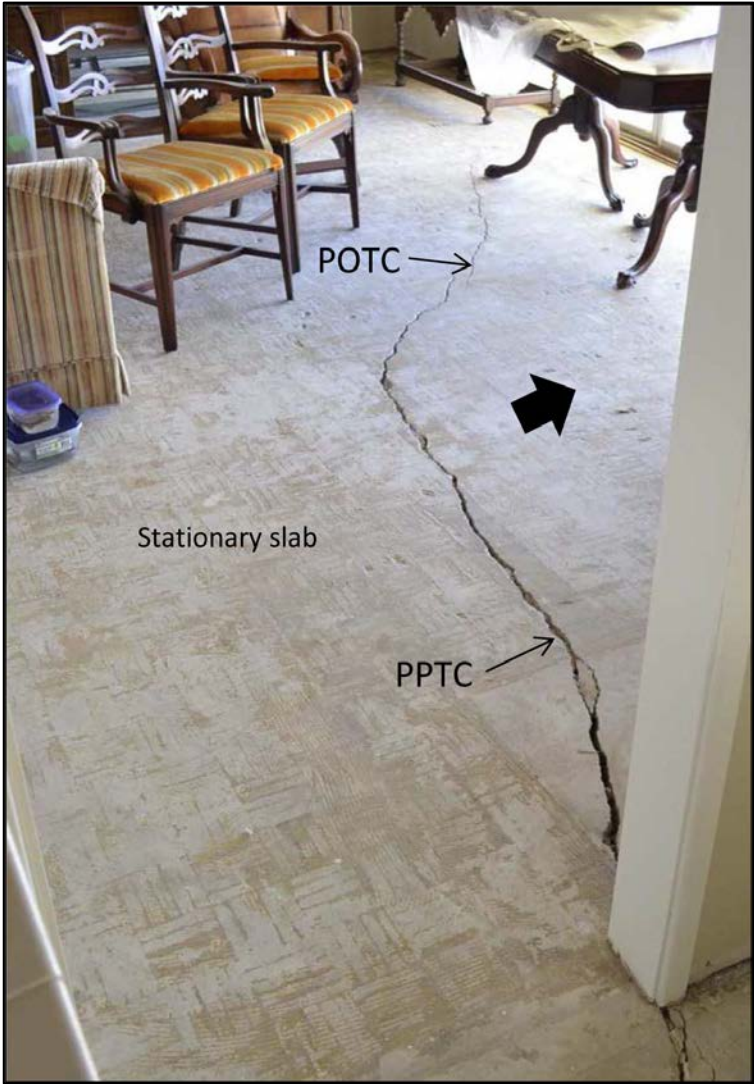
A PPTC- and POTC-type slab crack. Arrow indicates direction of horizontal extension of house foundation toward the rear yard top-of-slope.
